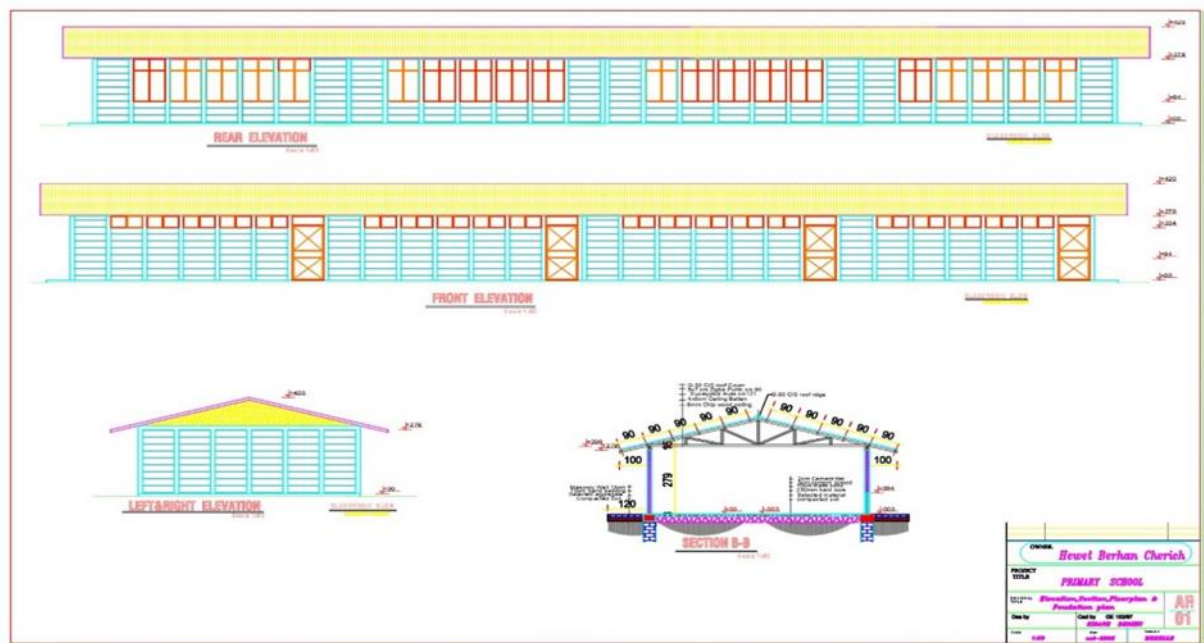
Typical elevation plan of element precast school constructed by Tigray education bureau
